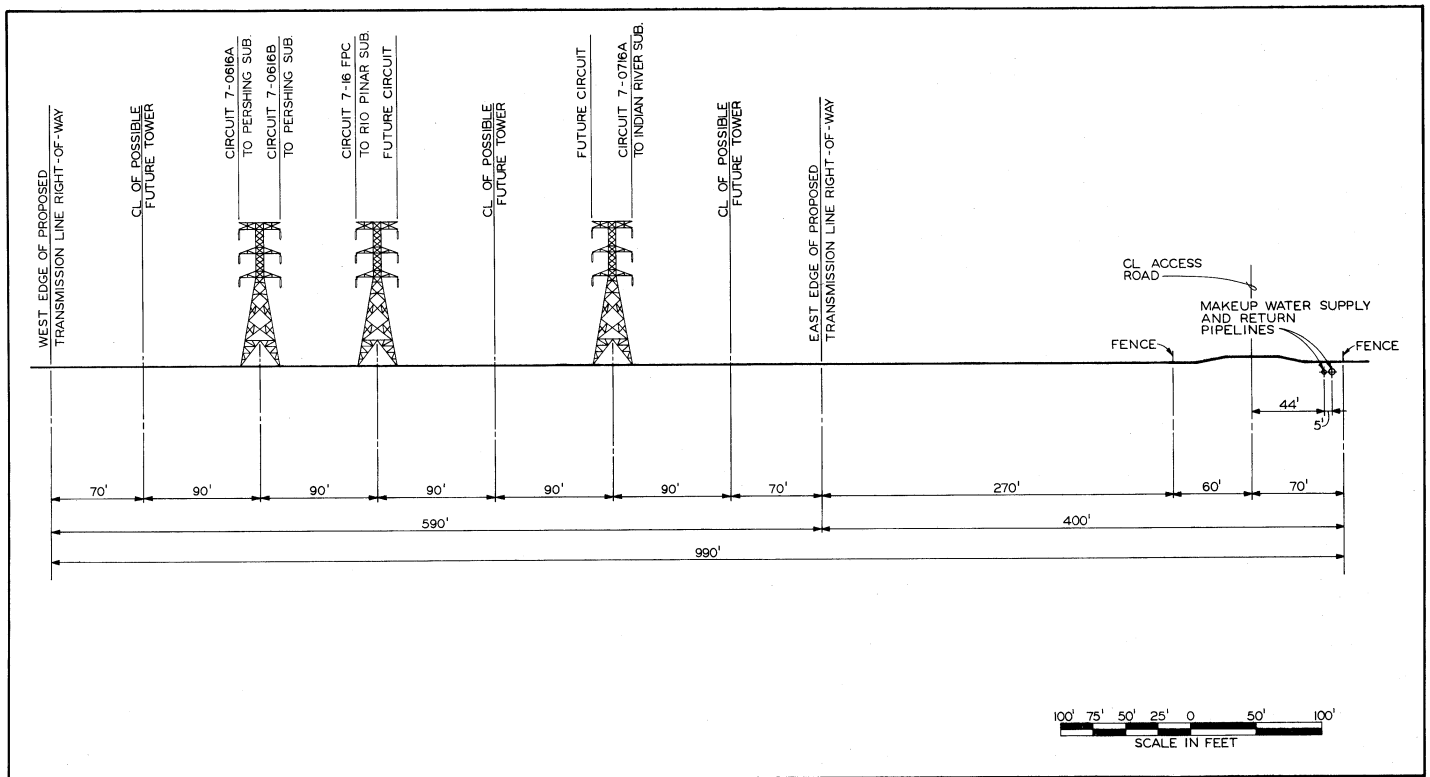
TRANSMISSION CORRIDOR ELEVATION EXITING SITE LOOKING NORTH
